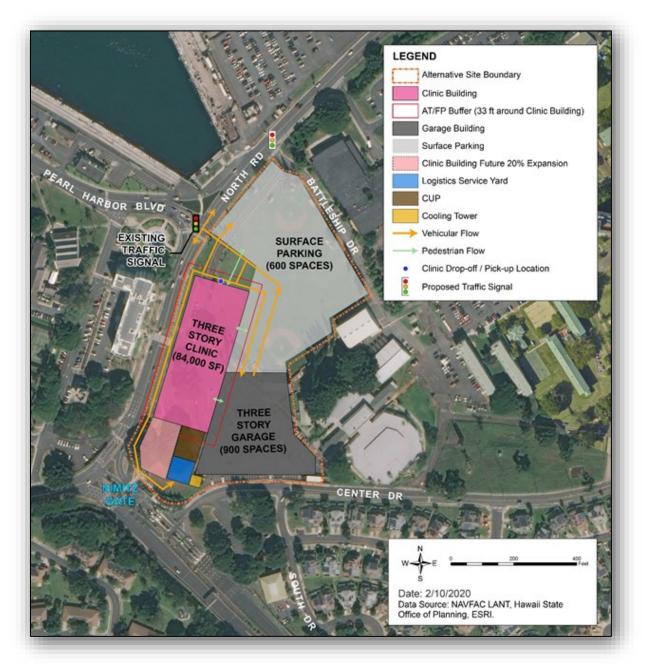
Proposed Conceptual Site Plan of Alternative 3: Bloch Arena Site
